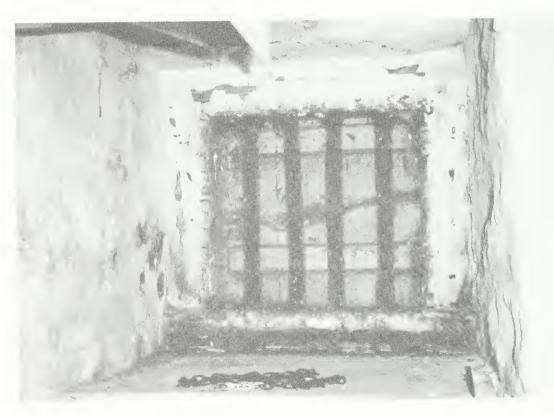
Cellar storage room (Room 002), west wall, window W001.
